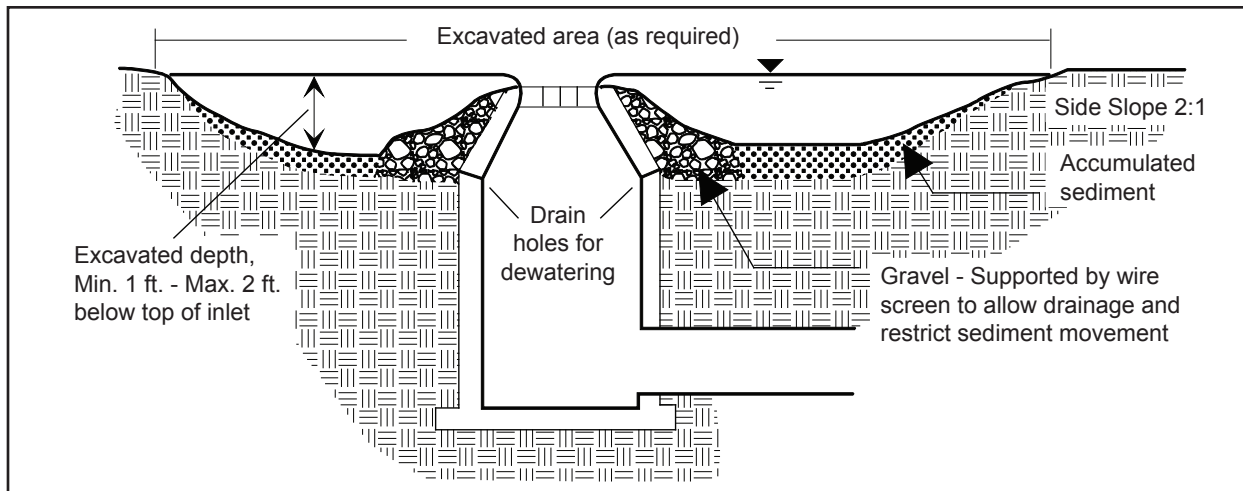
Cross section of Excavated Drop Inlet Protection
